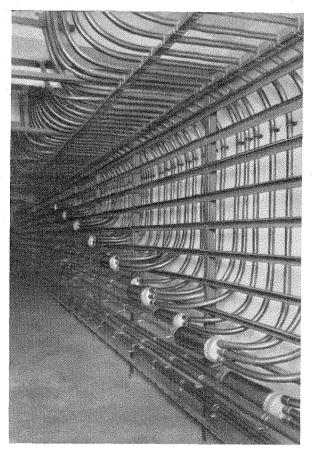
Modern installation of underground entrance cables of the Jordan central office, Madrid.
